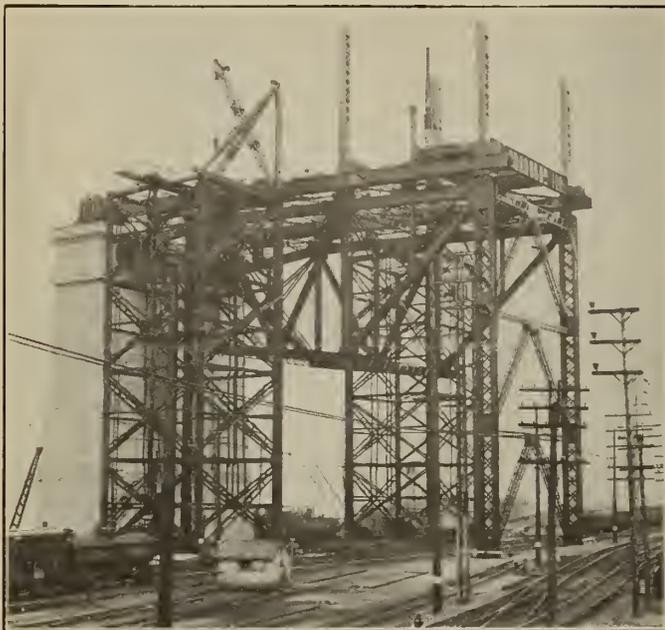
Main Span, North Side—Erection of Bottom Chords and Floor System on Falsework Span.
